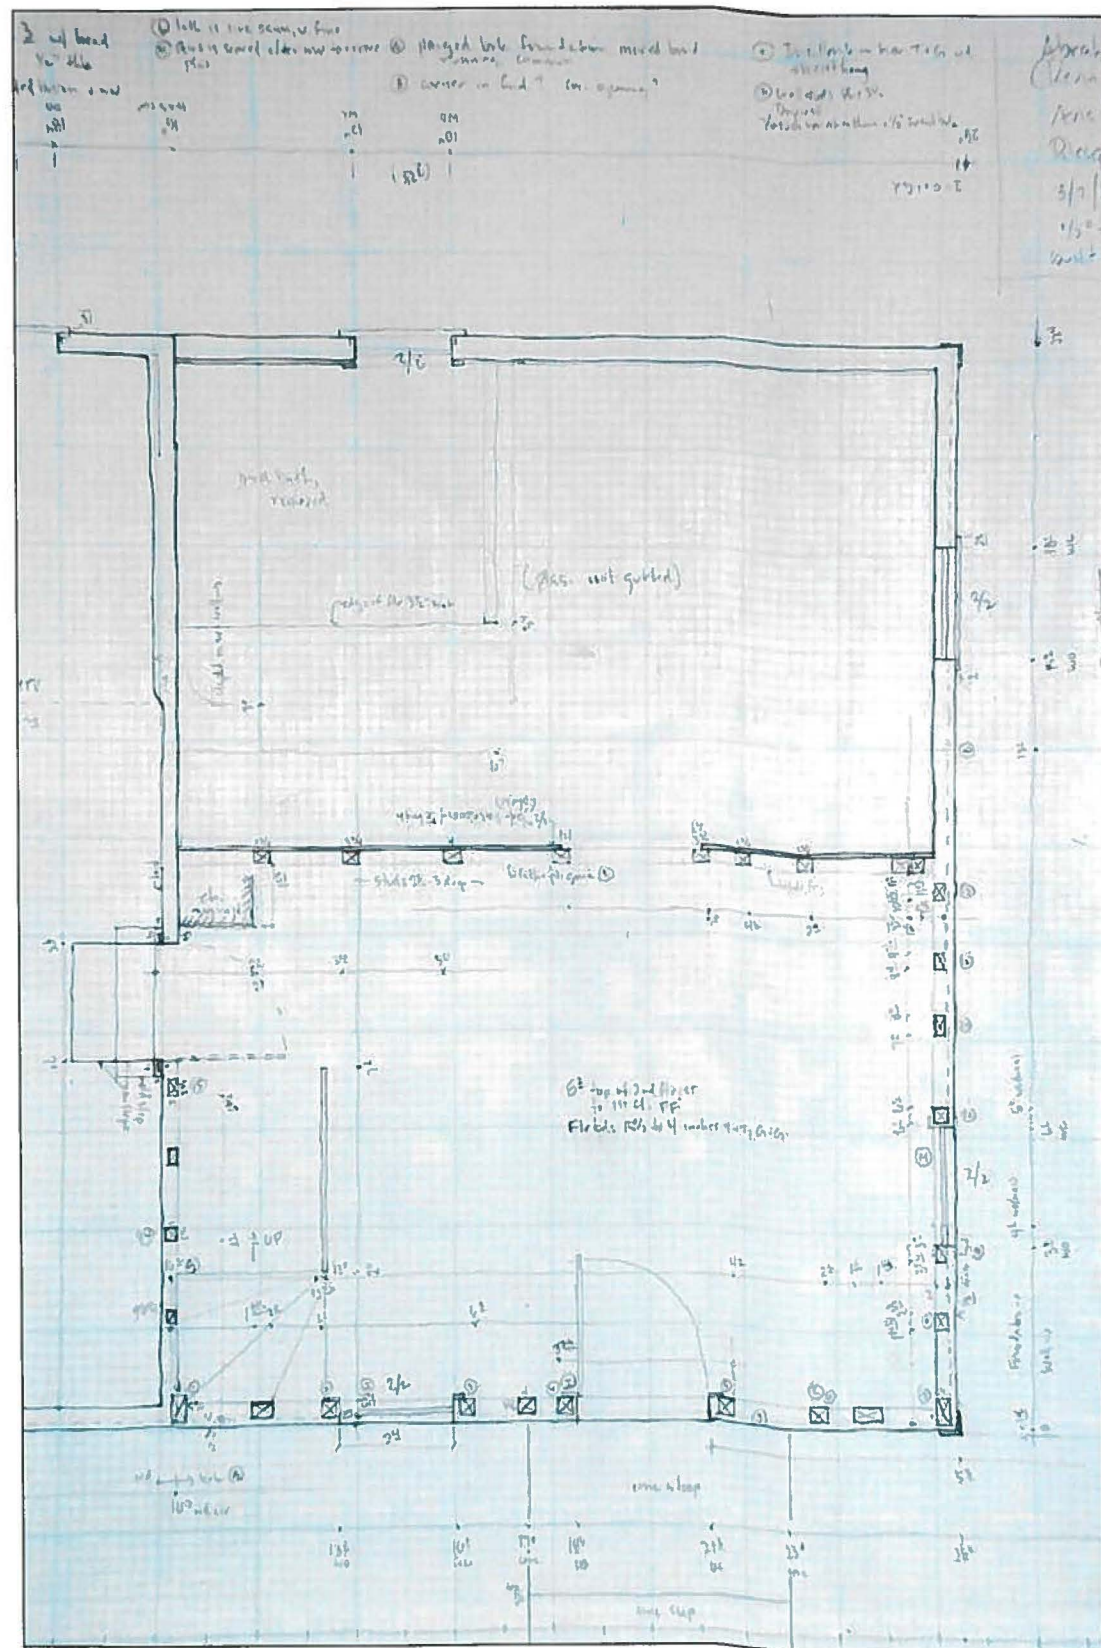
Richman House floor plan. Floor Joists Span the Entire Depth of the House and Rely on the Middle Partition for Support.
